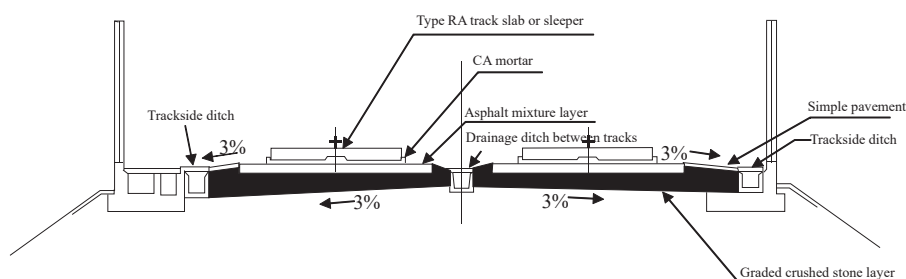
Schematic cross section of asphalt surface layer of subgrade bed for ballasted tracks in Japan
